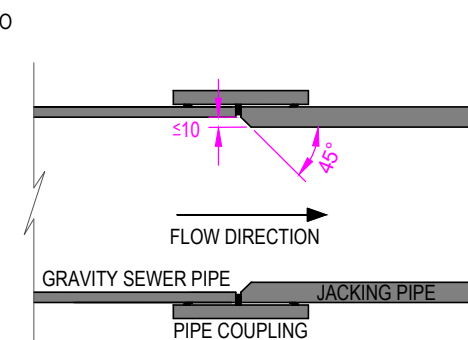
B-E: CC GRP GRAVITY PIPE TO CC GRP JACKING PIPE CONNECTION DETAIL
